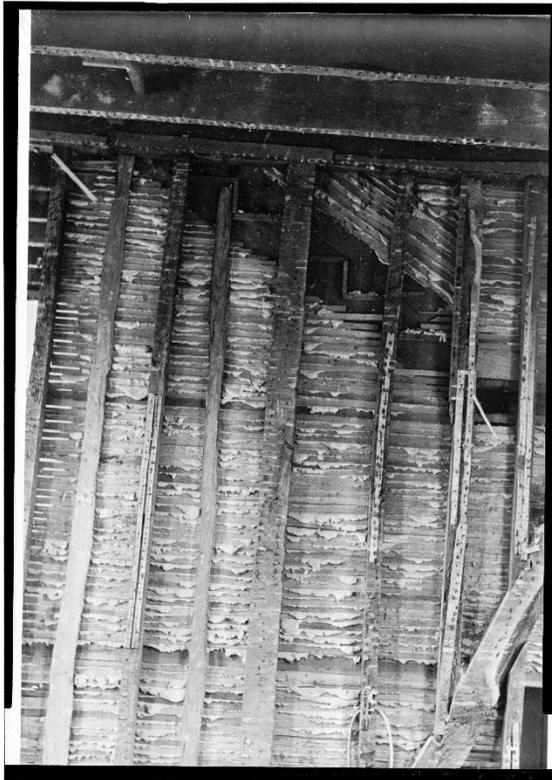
View of plaster and lathe wall in an unknown area, possibly adjacent to stairs ca. 1960. (Photo courtesy of HABS).
